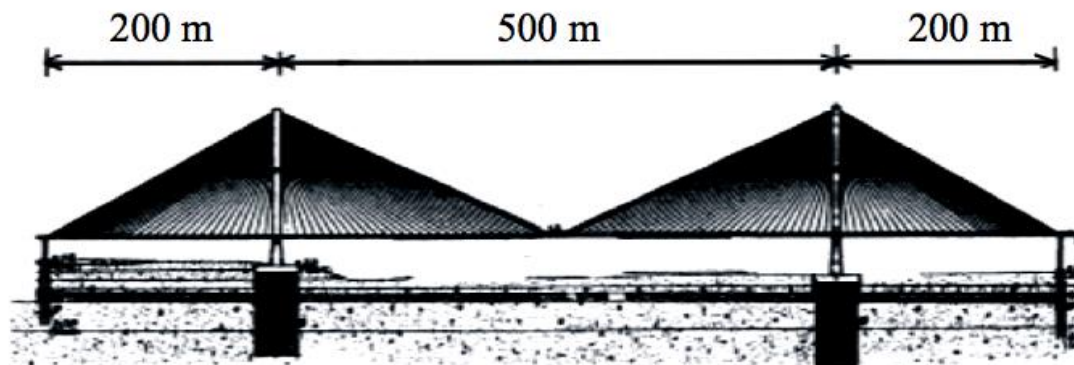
Elevation of the Jingsha Bridge in China (Zhang & Ying, 2006).
